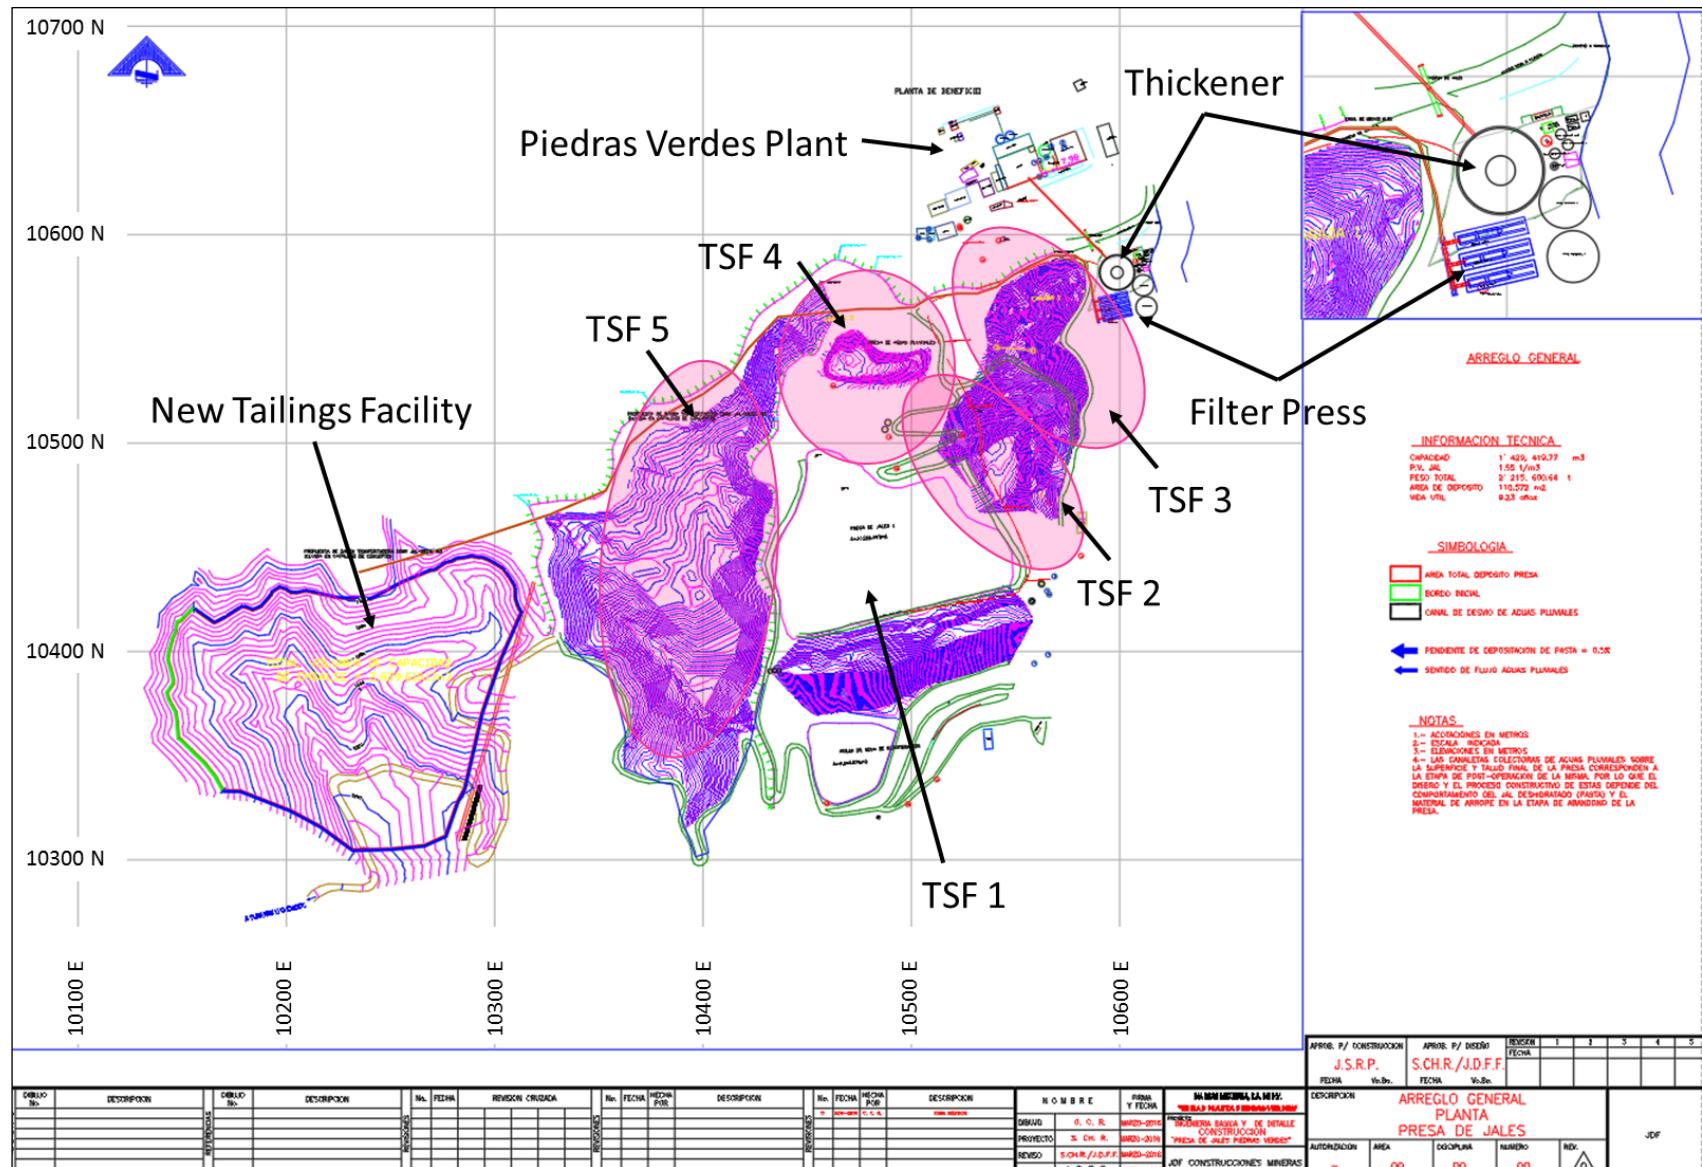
Overview of TSF Expansion Locations and Infrastructure
